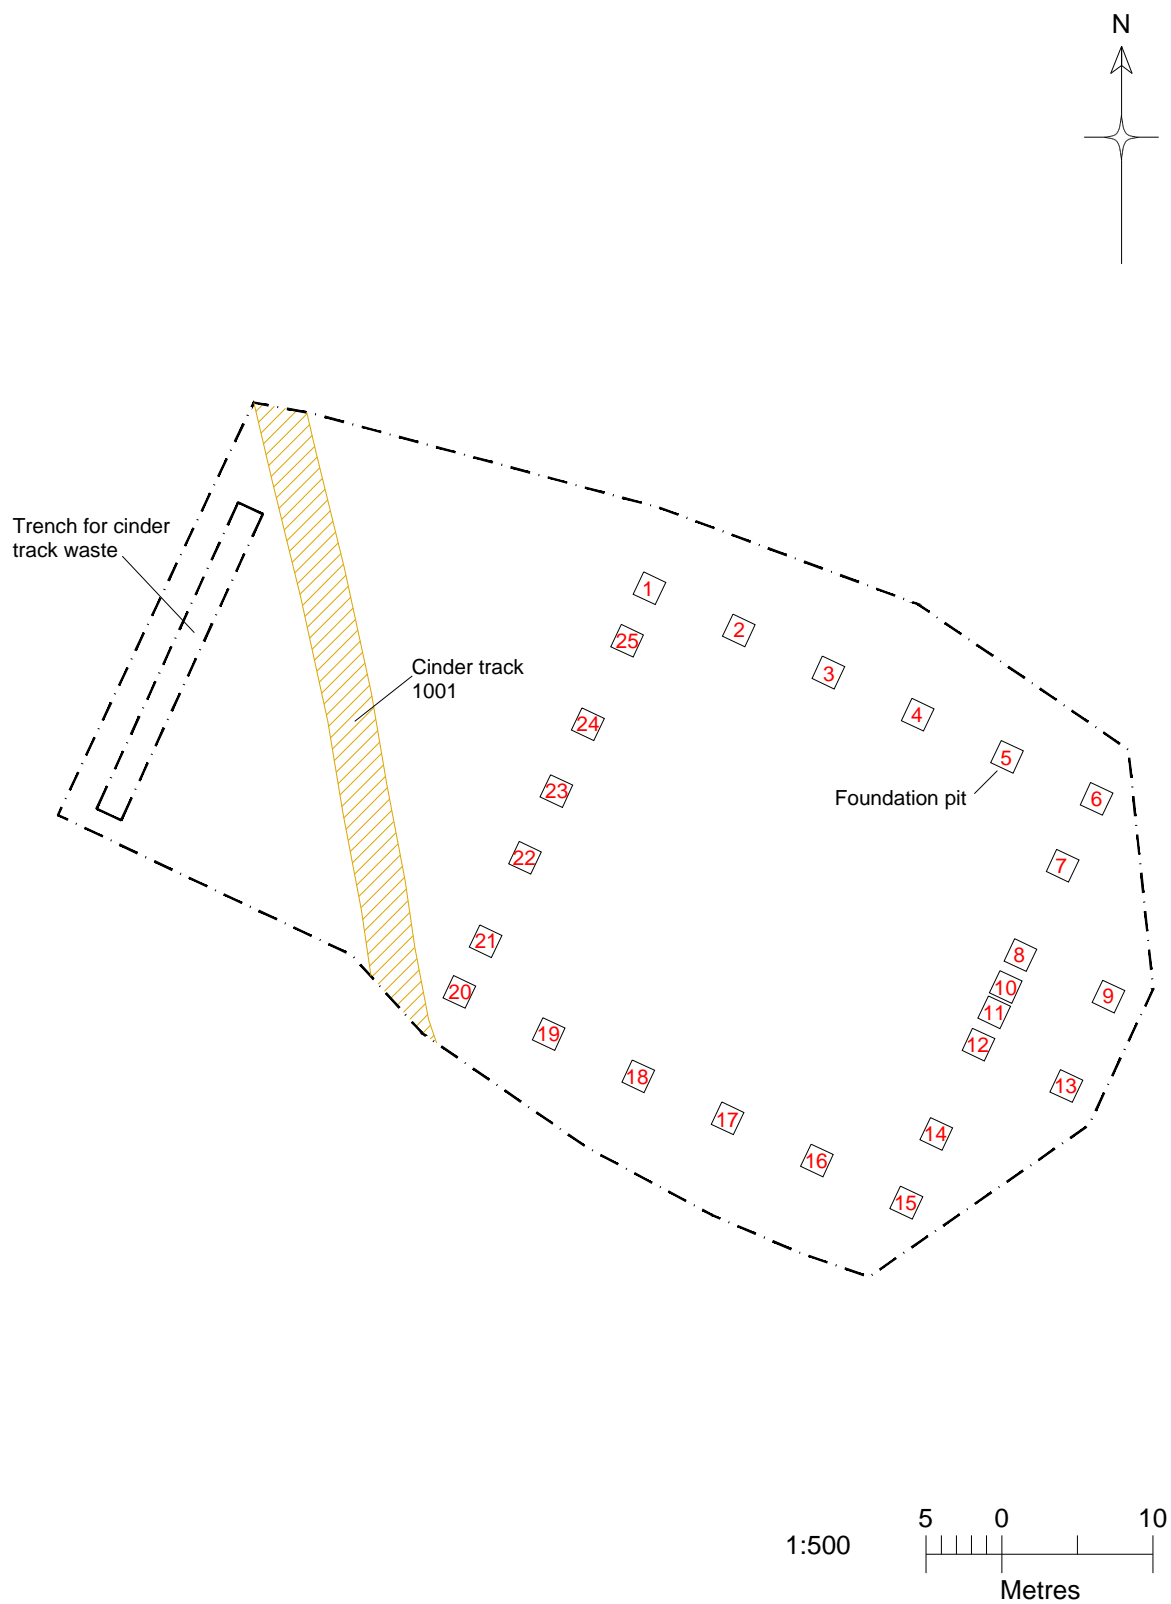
Levelled area, trench for cinder track waste and foundation pits
